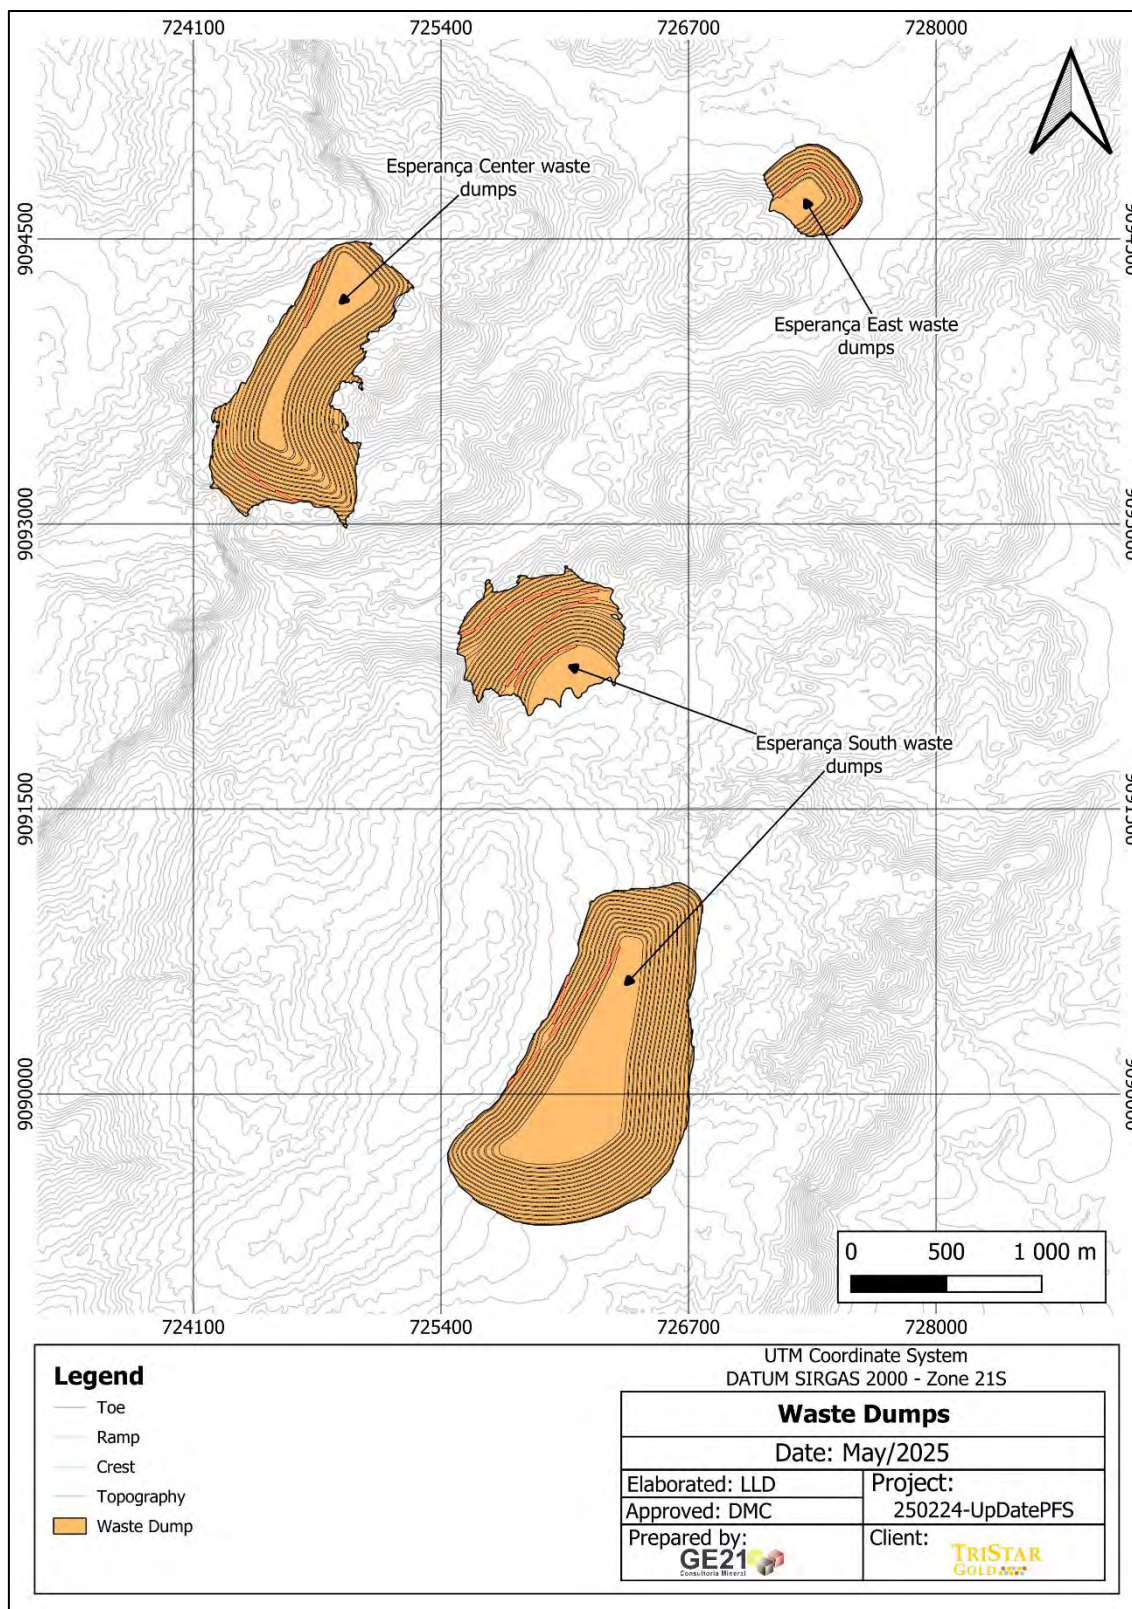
Waste Piles Layout for the Castelo de Sonhos Project
